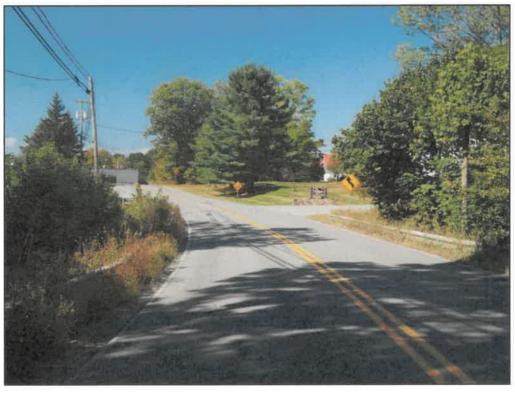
Richmond Road approaching 695 Richmond Road looking west
